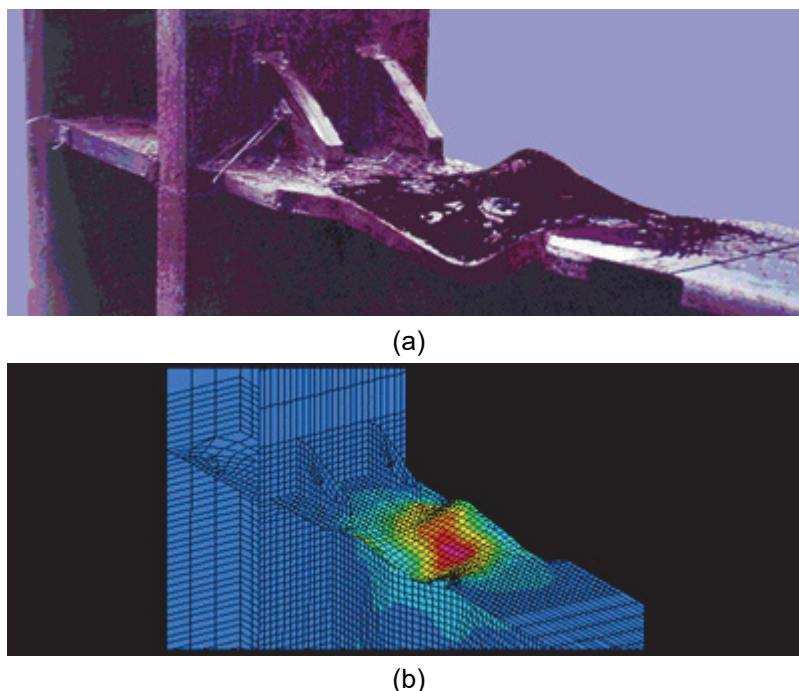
An example of local buckling: (a) of a test specimen; and (b) of a continuum finite element model simulation of a reinforced beam connection (provided by M. Willford, ARUP)
